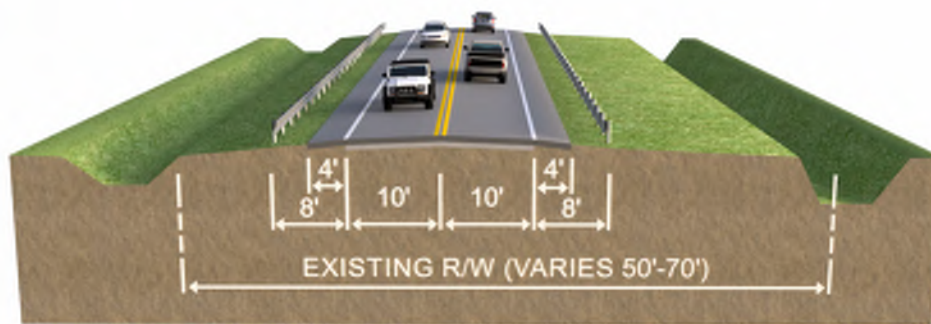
SR 70 – Existing Roadway Typical Section One
